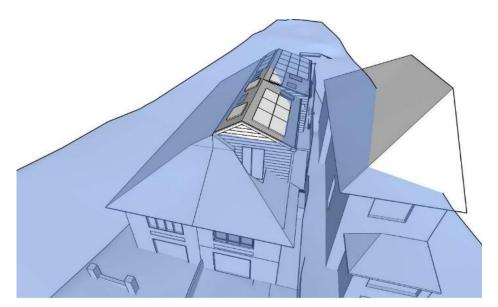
Extent of proposed roof beyond the building height development standard (8.5m building height plane shown in blue)
